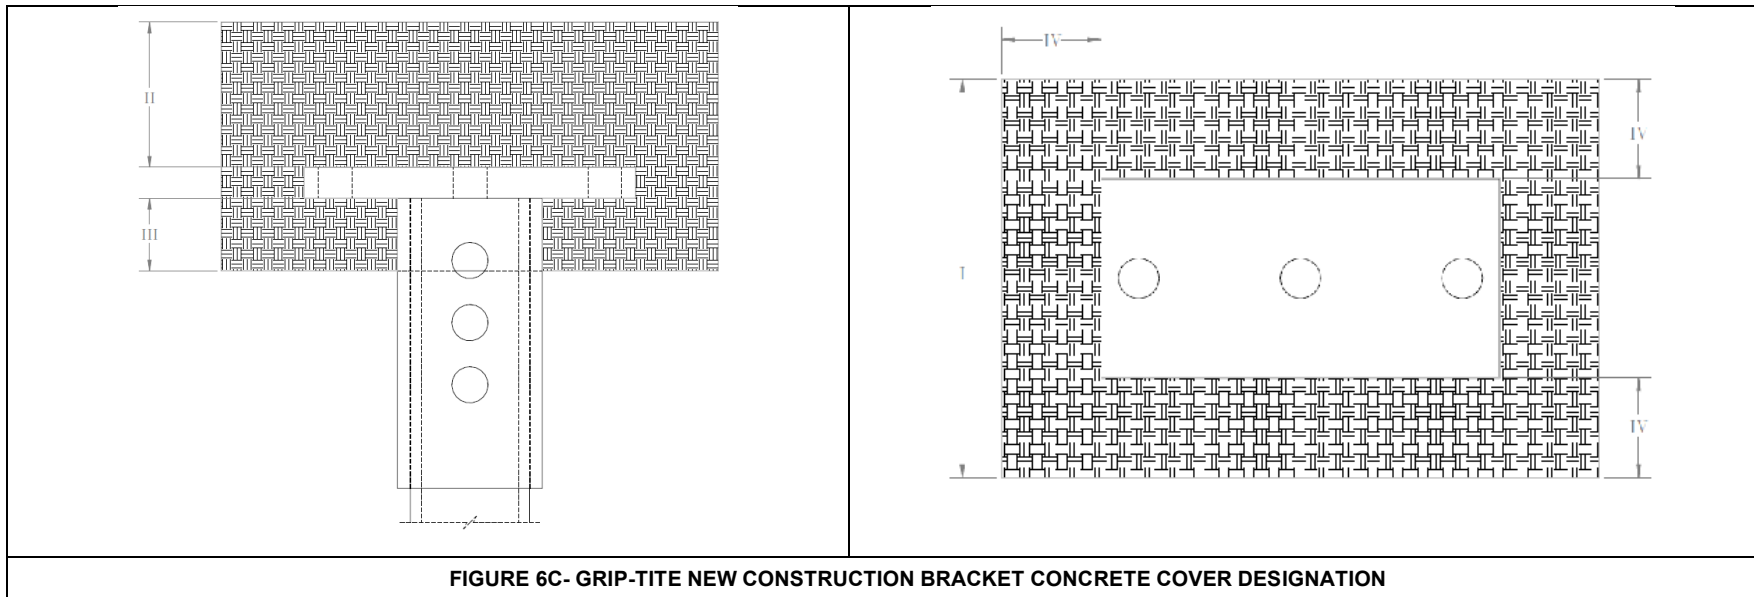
C- GRIP-TITE NEW CONSTRUCTION BRACKET CONCRETE COVER DESIGNATION
